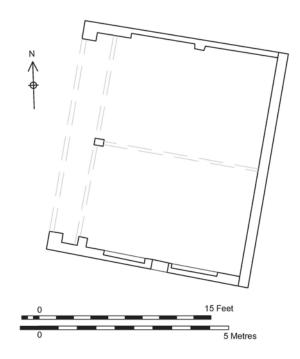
Floor plan of Building A (derived from plan supplied by client).
